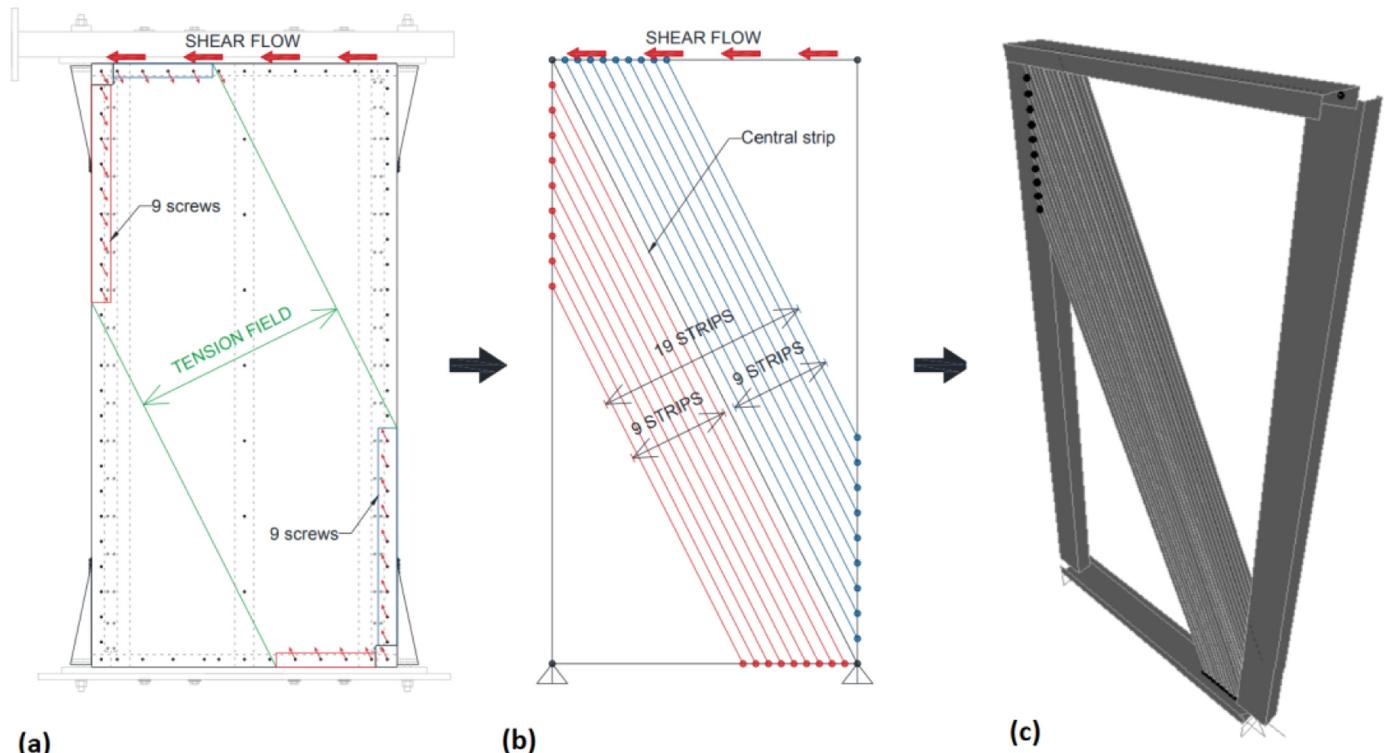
From experimental specimen to numerical model: a) screws located within the tension field b) equivalent frame elements for the numerical model c) numerical model in Sap2000 [109–111].
